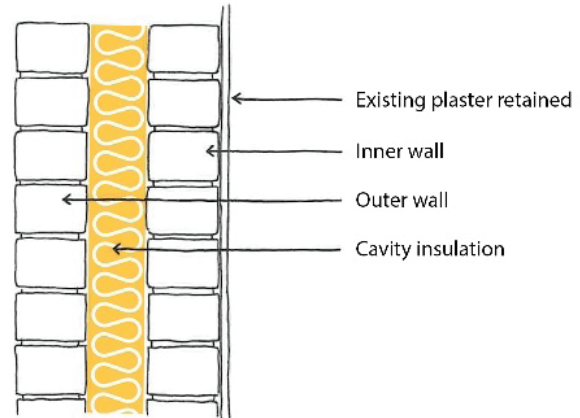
CAVITY WALL INSULATION (USING BRICK WALL EXAMPLE)
